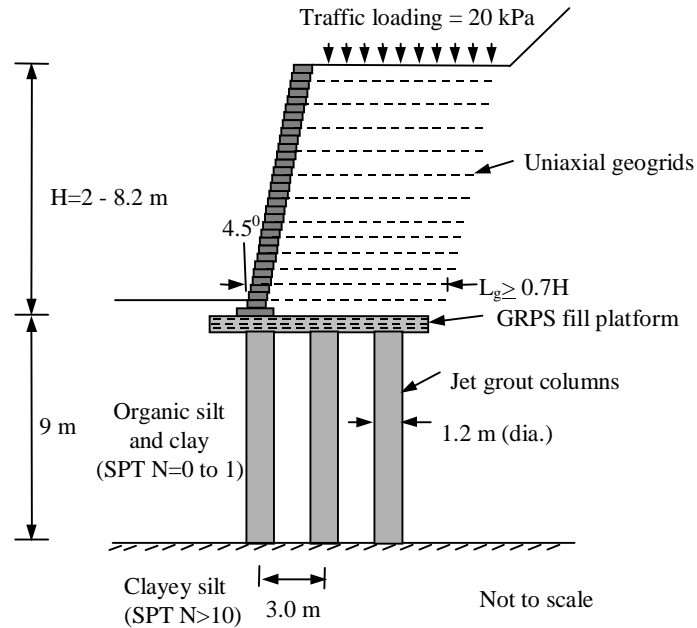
Typical Cross Section of SRWs on the GRPS System (Alzamora et al., 2000)
